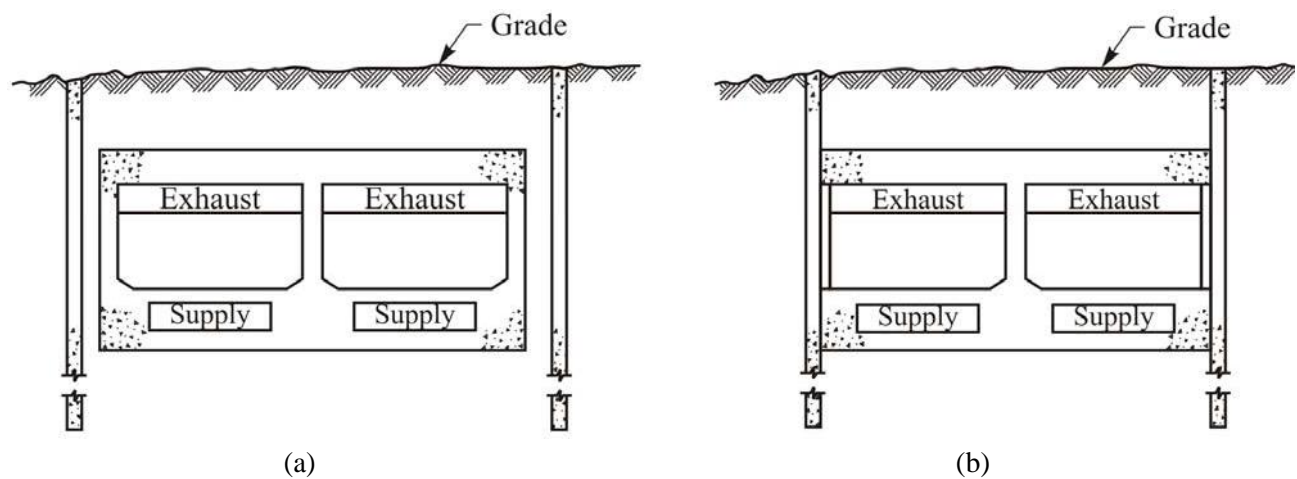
Cut and Cover Tunnel Bottom-Up Construction (a); Top-Down Construction (b)
